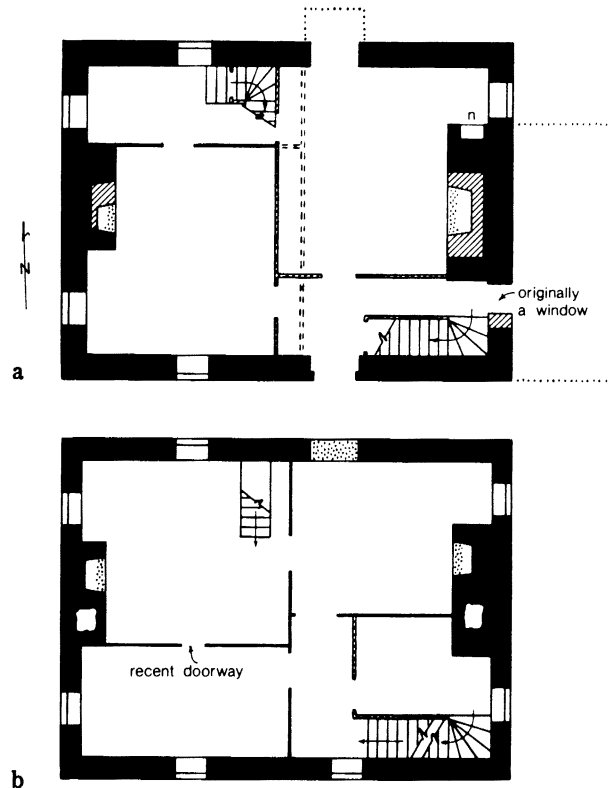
Abraham Heiston House. First- and second-floor plans.
